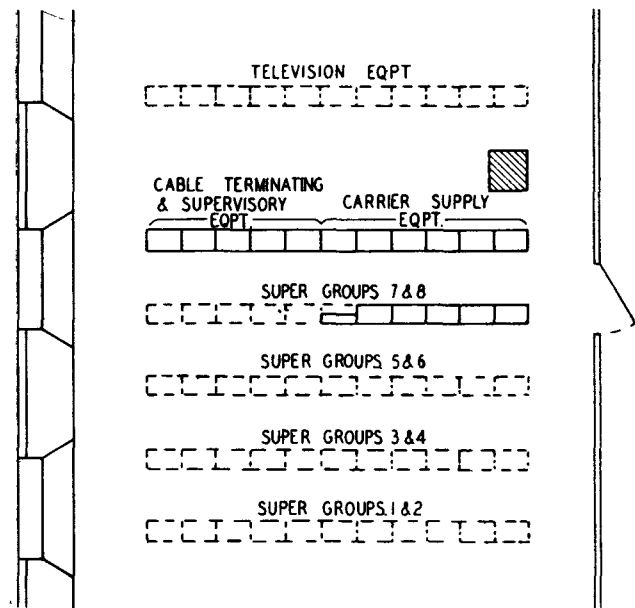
RACK LAYOUT, LONDON TERMINAL STATION.
